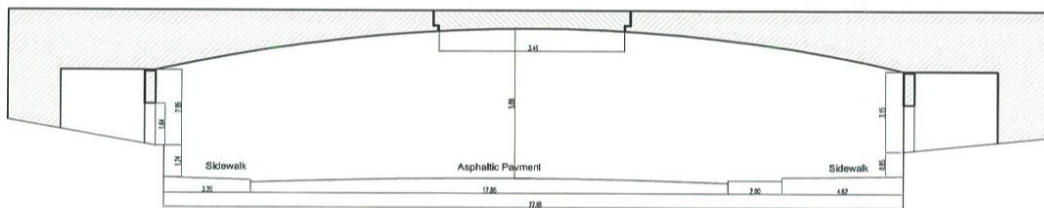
Disposition of simple beam slab in the span of bridge (section 7-7)
